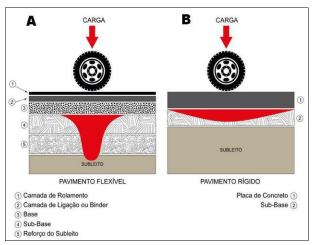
Load distribution: Flexible pavement (A); Rigid floor (B).
